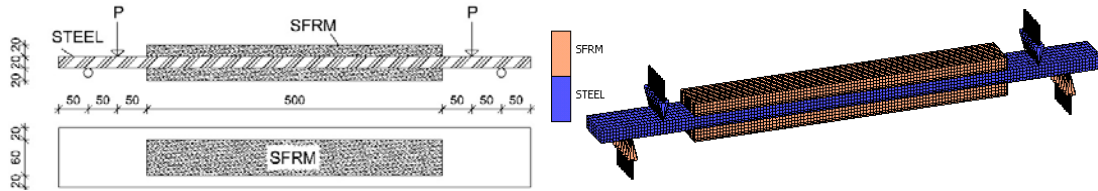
a) Test configuration (dimensions in mm) and b) mechanical model of the SFRM coated steel plate
